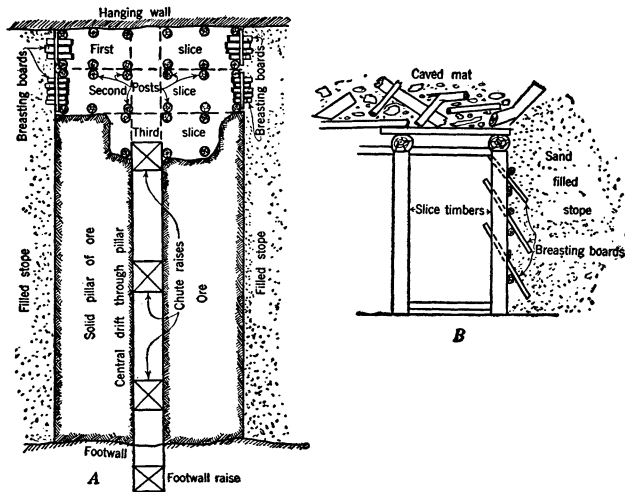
Top-slicing pillars, Franklin, N. J.: *A*, Plan of slice floor; *B*, method of breasting off sand filling.
